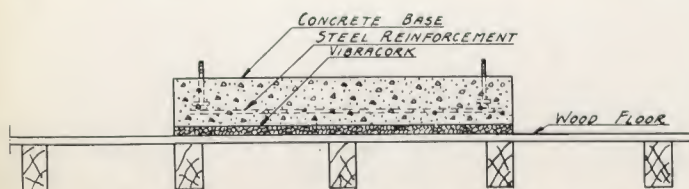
FLOATING FOUNDATION—MILL TYPE FLOOR
